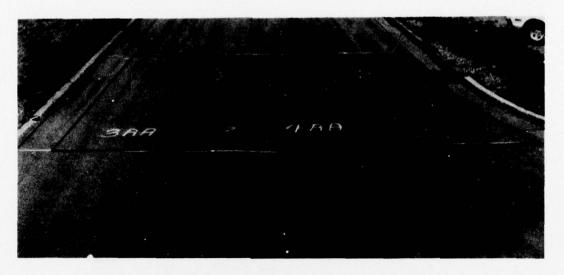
Fort Lewis--reflection crack in control section on north side of Faith Avenue
